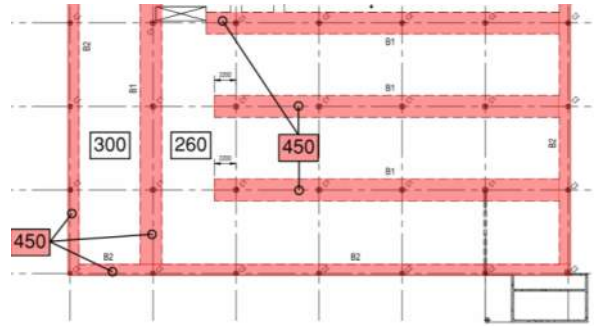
Model 2 slab and beam thicknesses south of the lift core.
